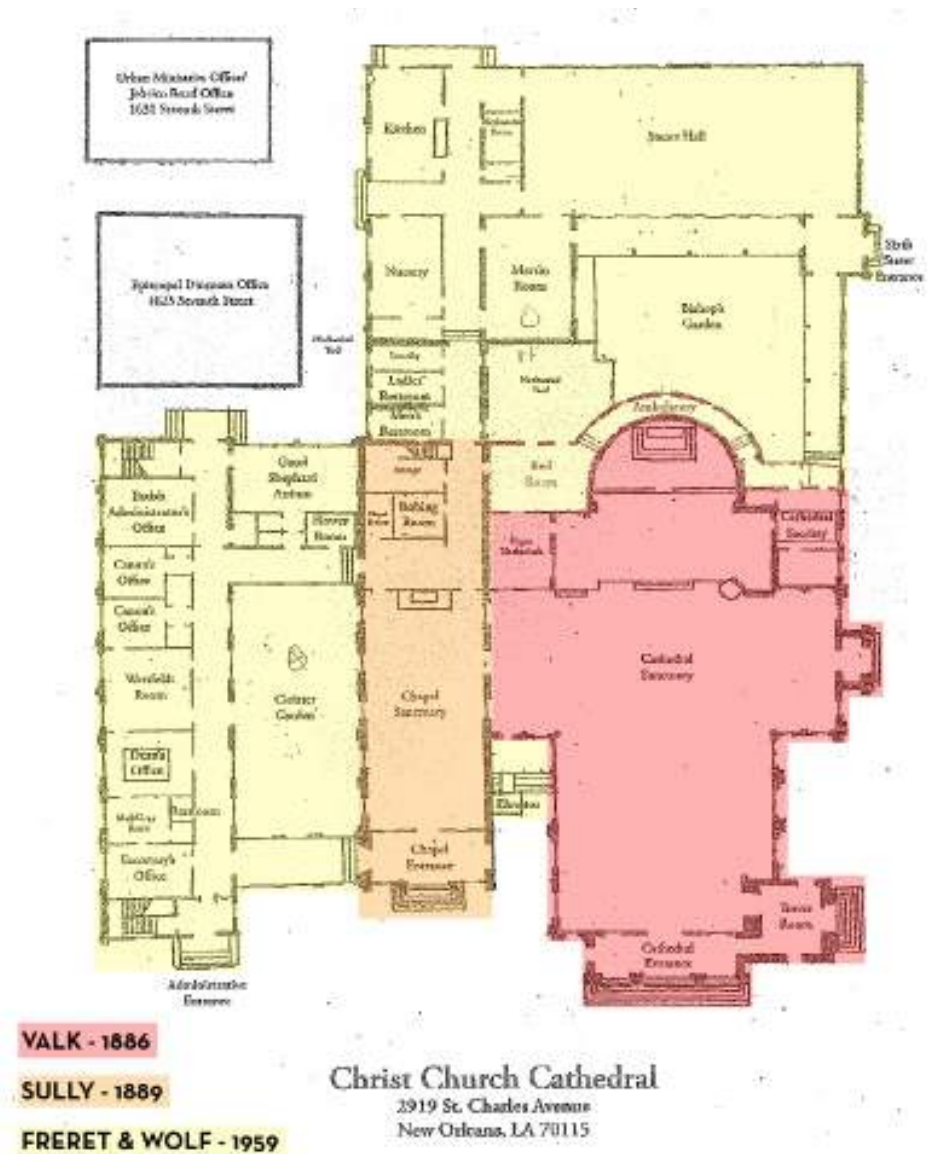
Floor plan and phases of construction. Graphic by Laura Stokley, 2015
